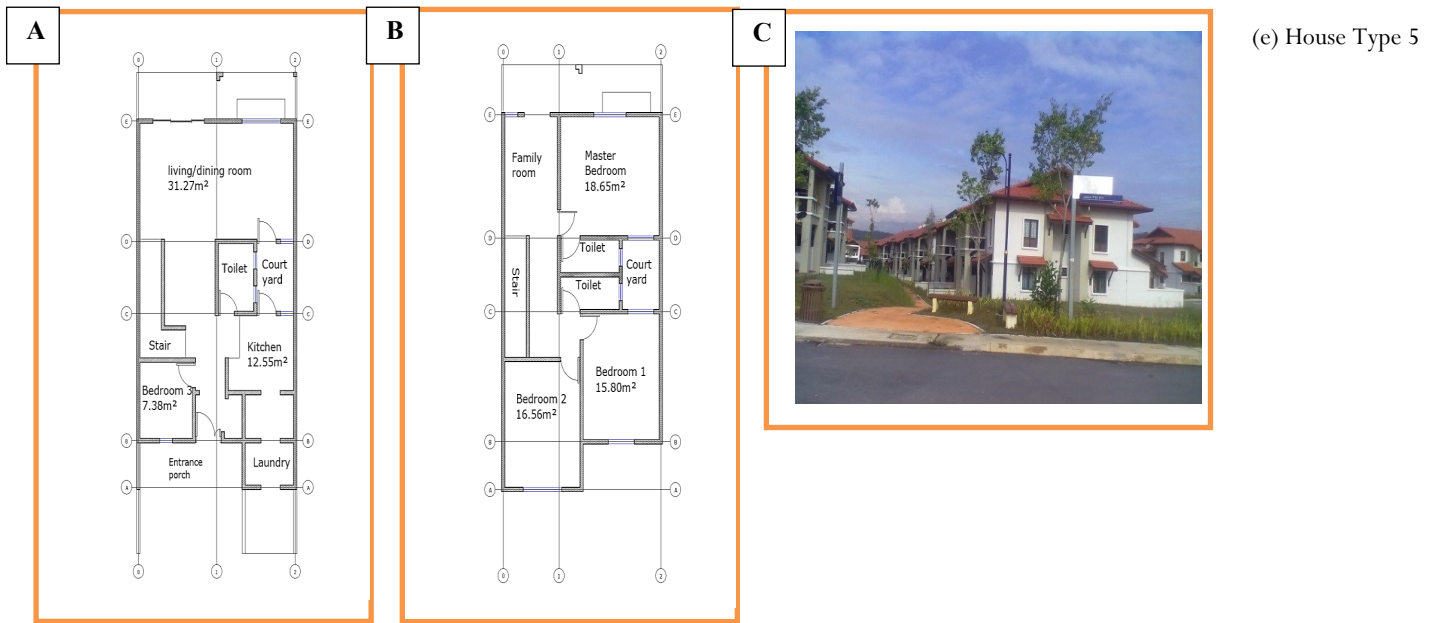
Perspectives and floor plans of selected terrace house types (A represents Ground floor, B, First floor and C, perspective view)
